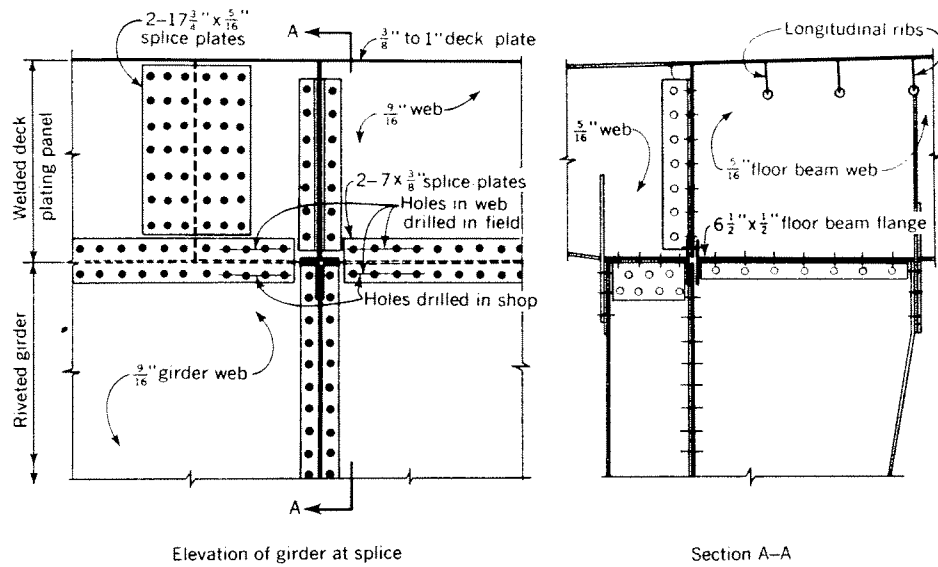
Detail of splice between the deck plating and the main girder, Save River Bridge, see Fig. 1.8
